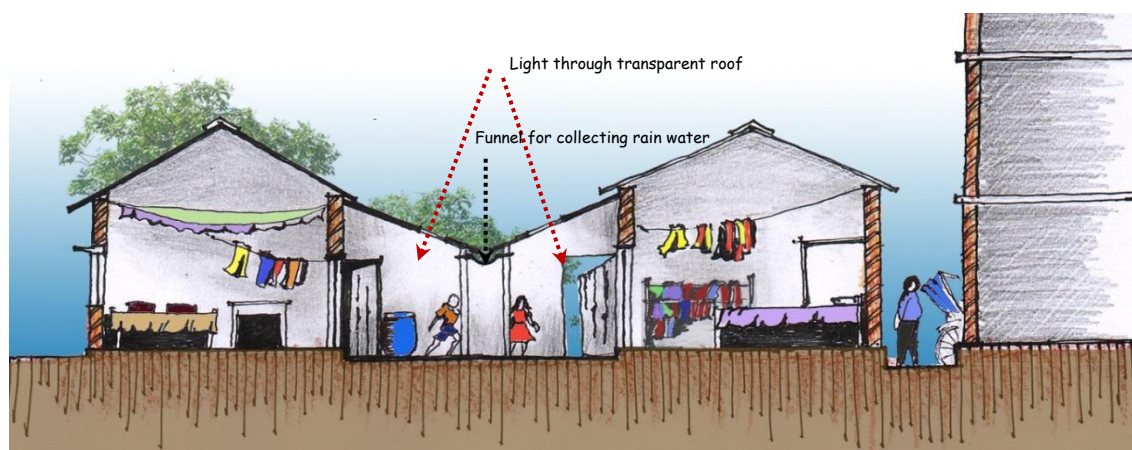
Owner built house with roof lighting and rainwater harvesting in Rokeya’s settlement, Sirajganj.
